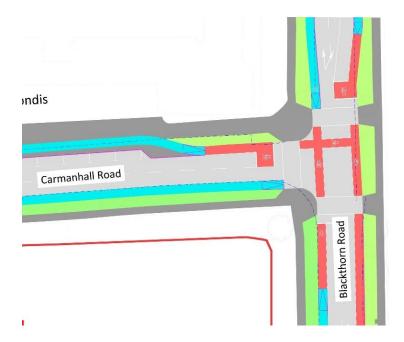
Junction 2: Carmanhall Road / Blackthorn Road (Signalised junction with traffic lane width of 3.25 m)
